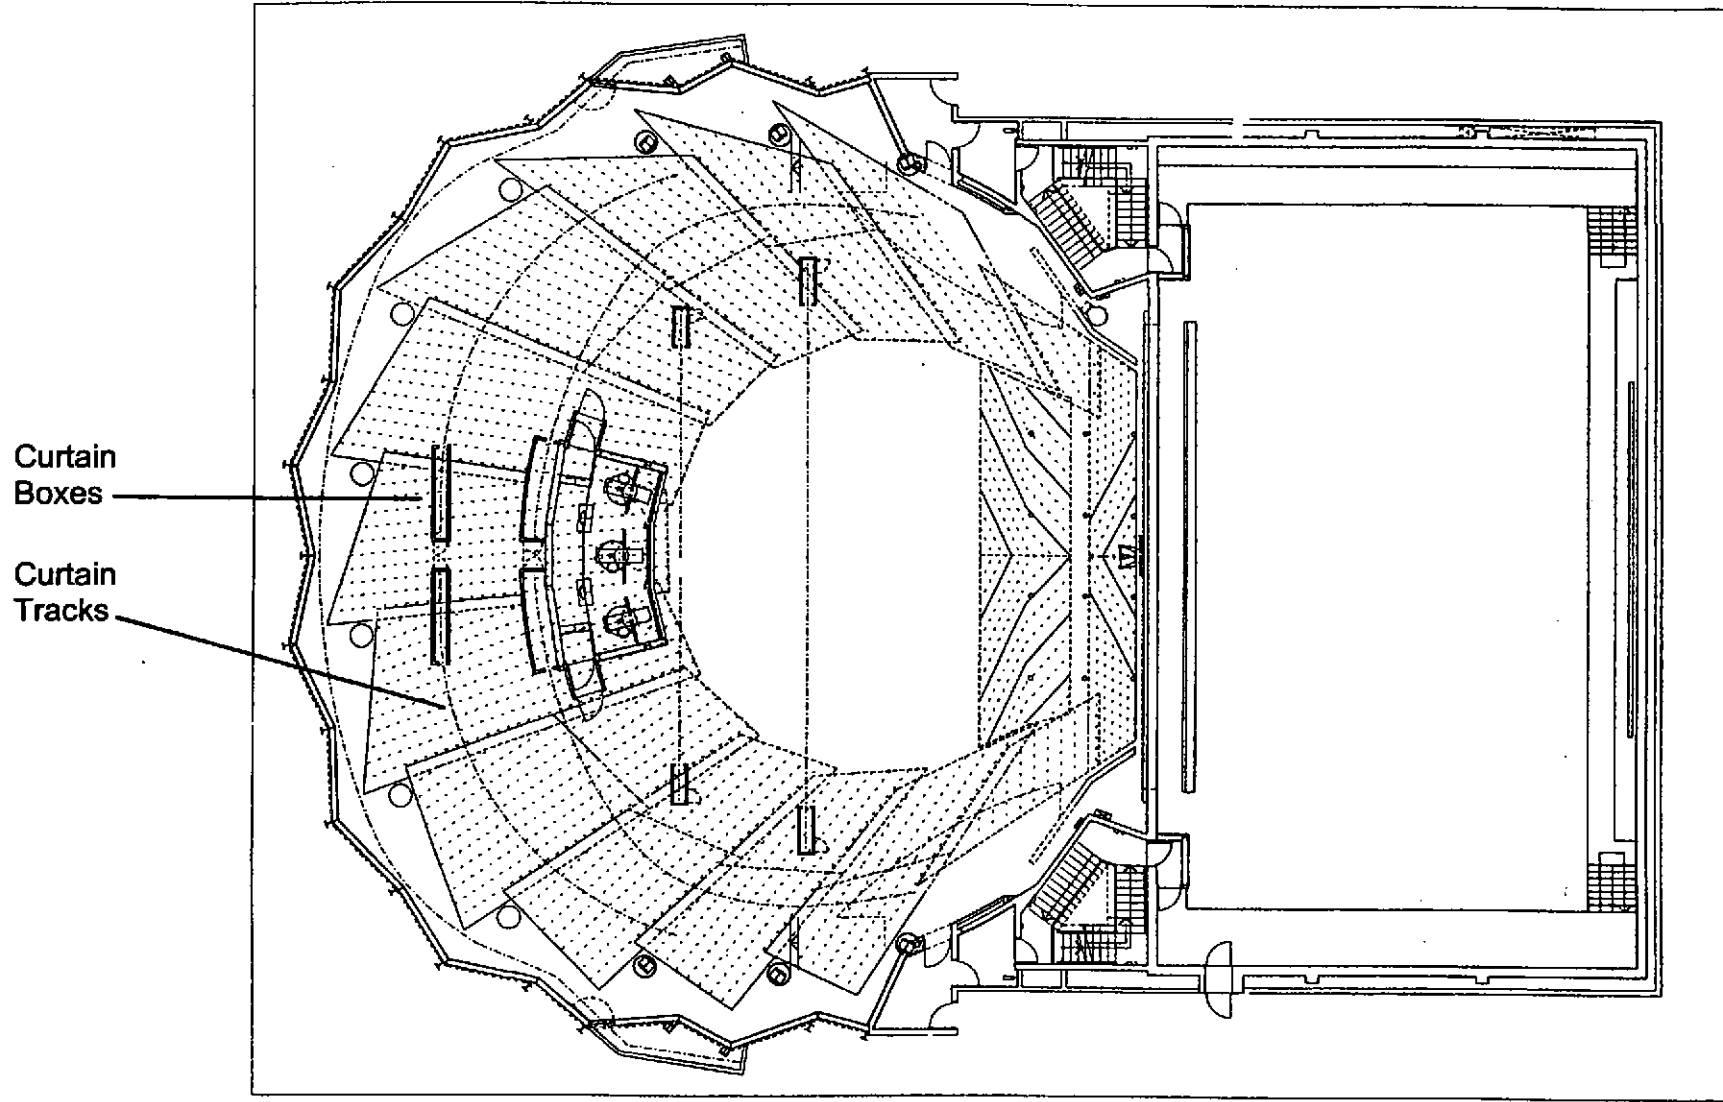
Reflected ceiling plan showing 'petals', curtain boxes and curtain tracks
